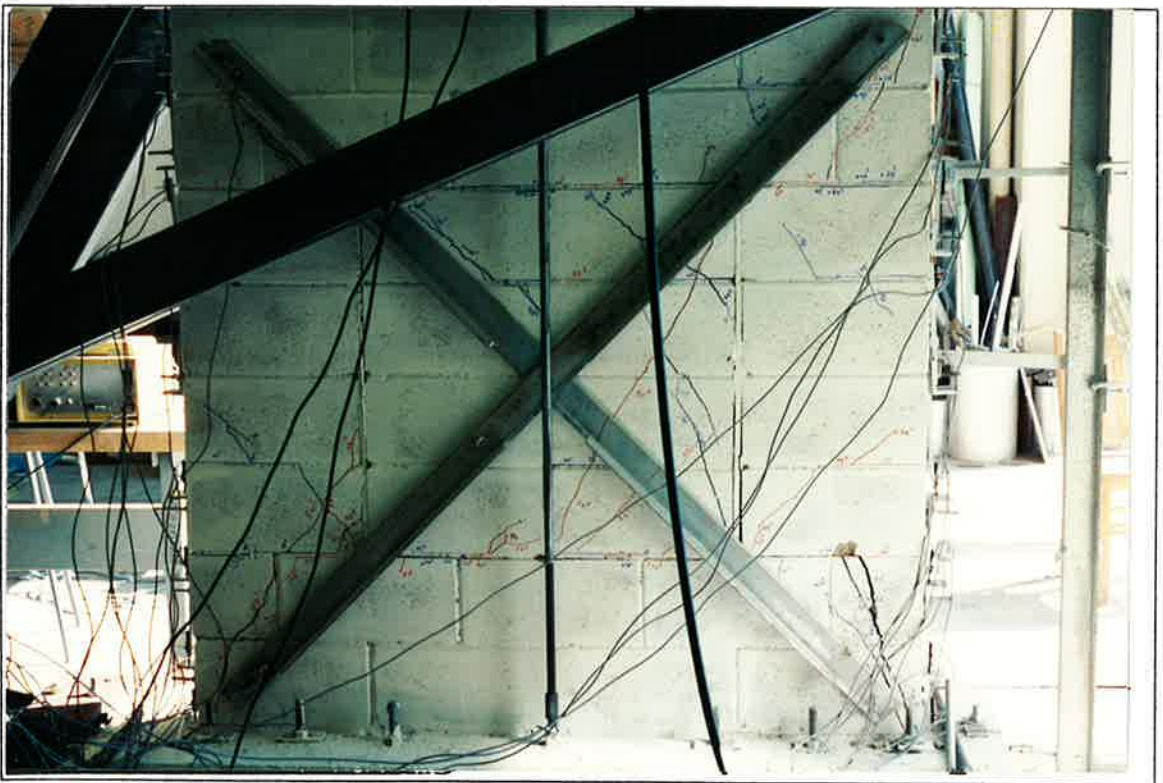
Slitted Wall North Face At 245 kN (55 Kips) Lateral Load
